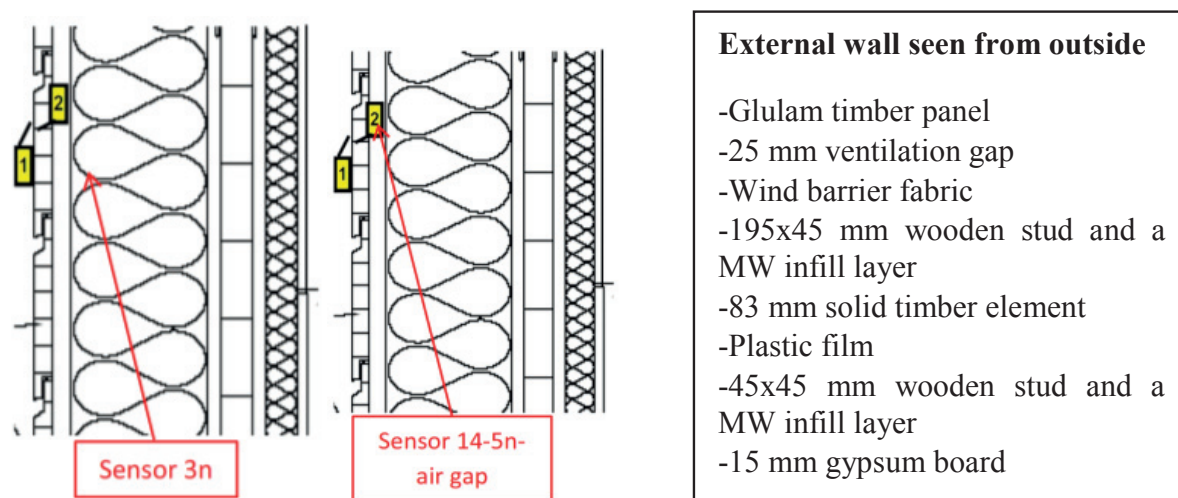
Two similar vertical cross-sections of external walls with placement of sensors 3n and 14-5n.
